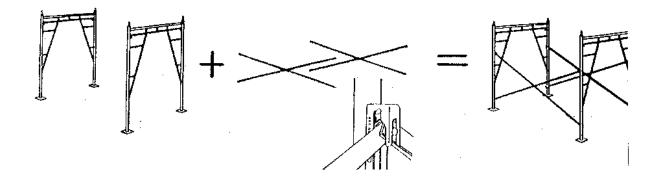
Tubular Welded Frame Scaffold Example
